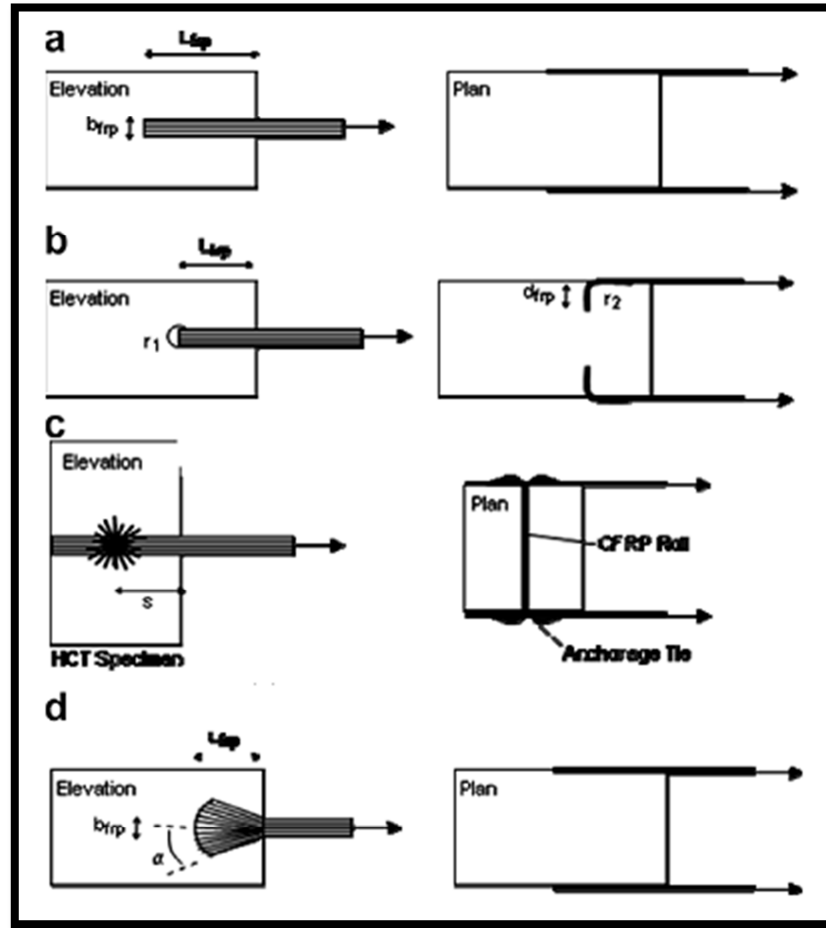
Anchorage Layouts (a) Standard epoxy bond, (b) Embedded anchor for concrete unit, (c) embedded anchor for hollow clay tile, (d) fan anchor (Camli and Cinici, 2006)
